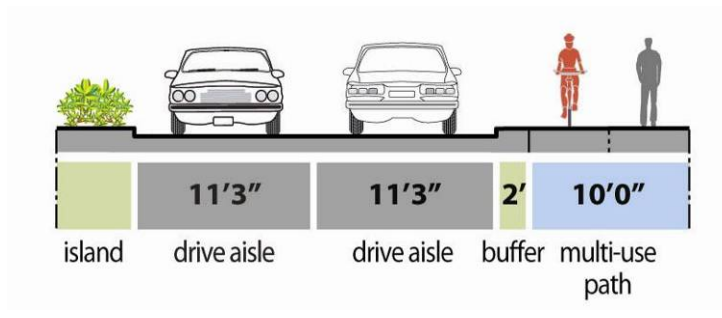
Segment 1A Parking Lot 1 Proposed Improvements
